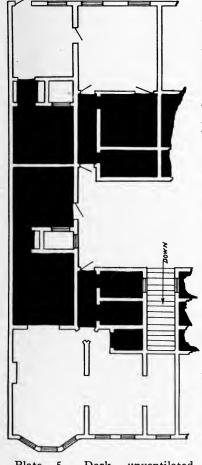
Dark, unventilated rooms and toilets in buildings shown in Illustration 17.
